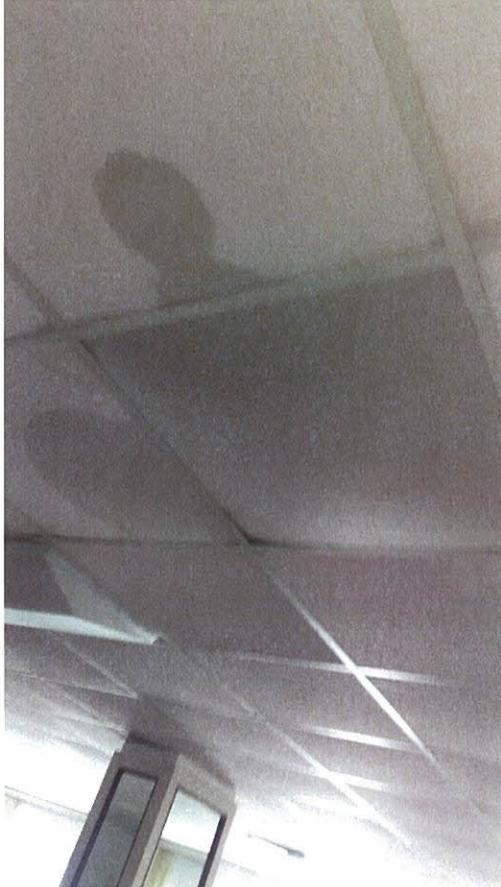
Water damage at lounge area roof that entered through openings created by buffeting of windows due to Irma's wind pressures (south tower).
